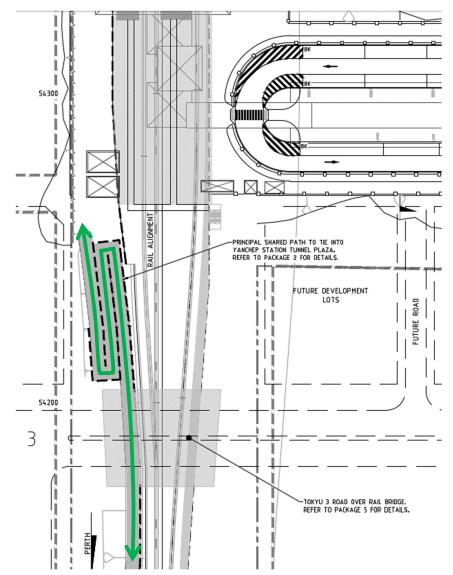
Yanchep Station – PSP Alignment and Ramp Arrangement
